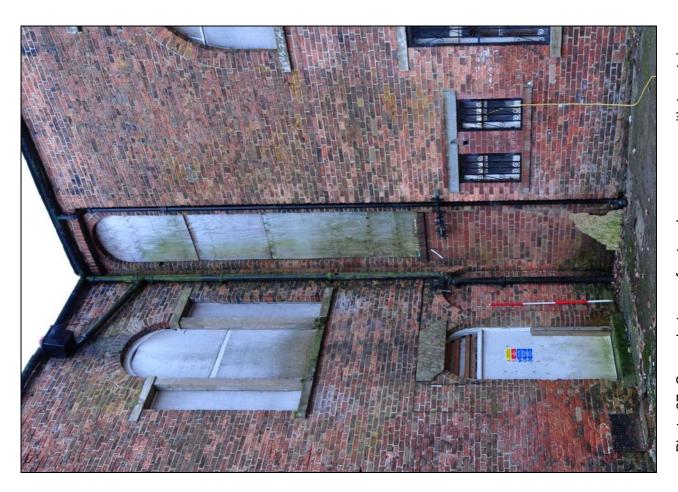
Corner between front and rear ranges, with two stair windows, looking south-west
